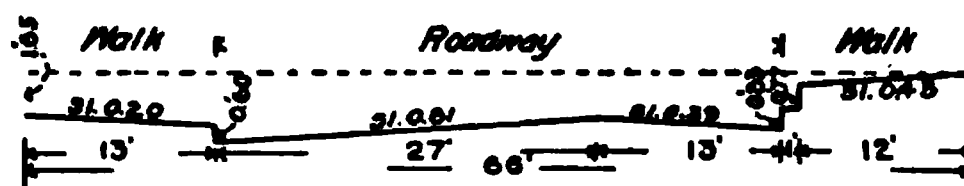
CROSS SECTION OF STREET ON A SIDE HILL.
